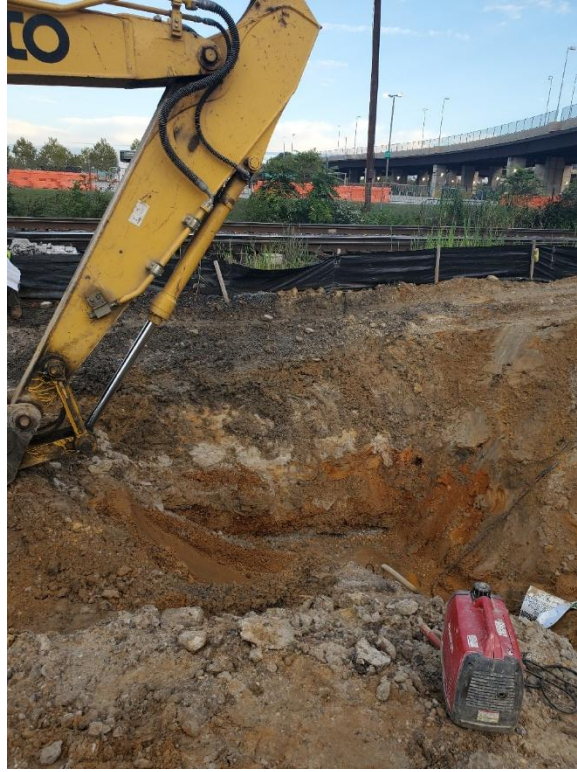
Stormwater Management Detention Basin Project Area, facing northwest. Note, electrical conduits.
